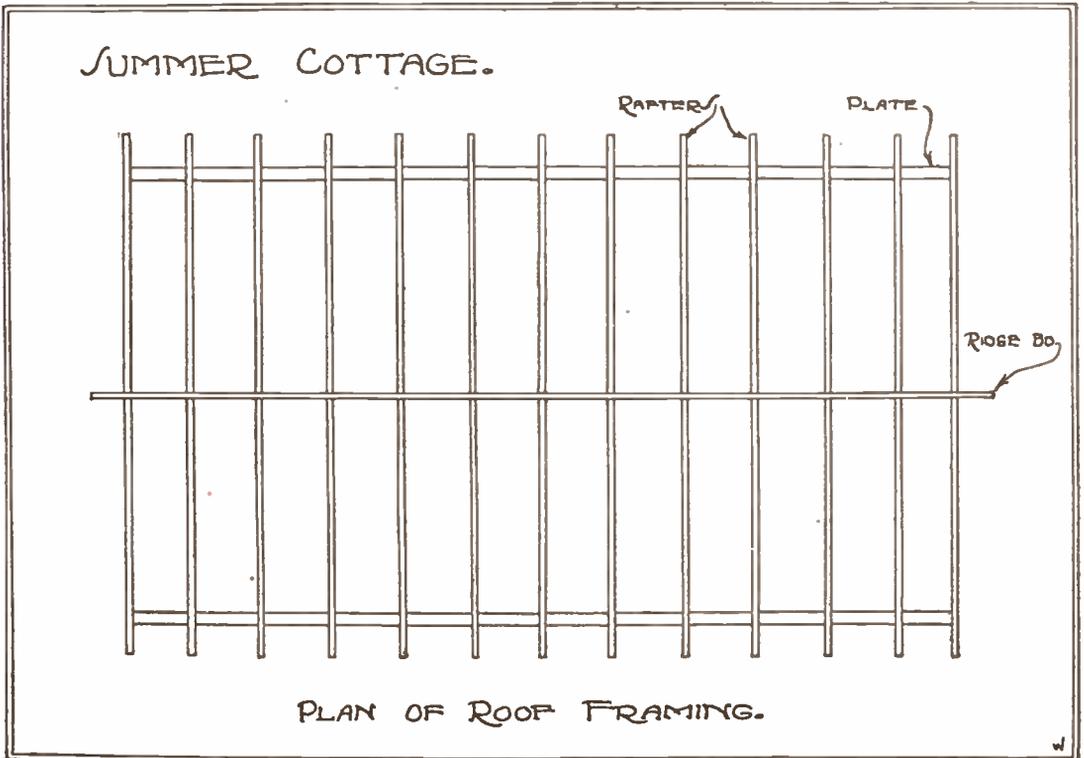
Plan of the Rafters as they Should Appear After Being Nailed in Place.
